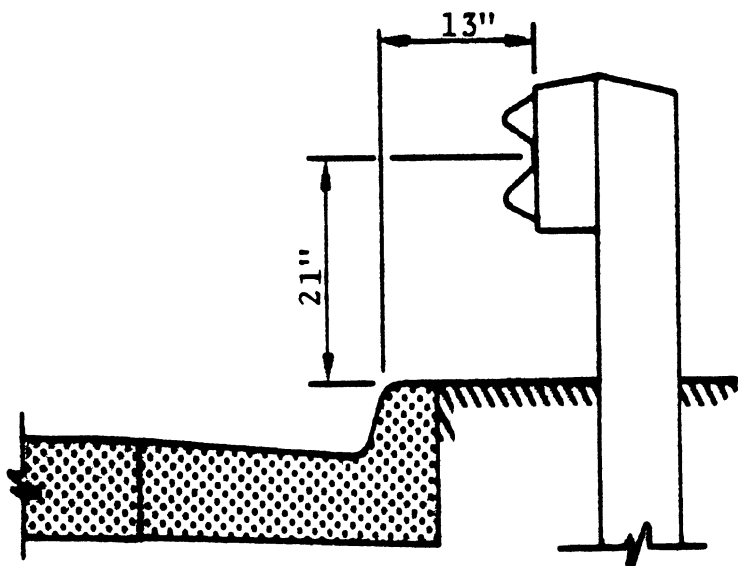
TYPE B GUARDRAIL WITH CURB C
